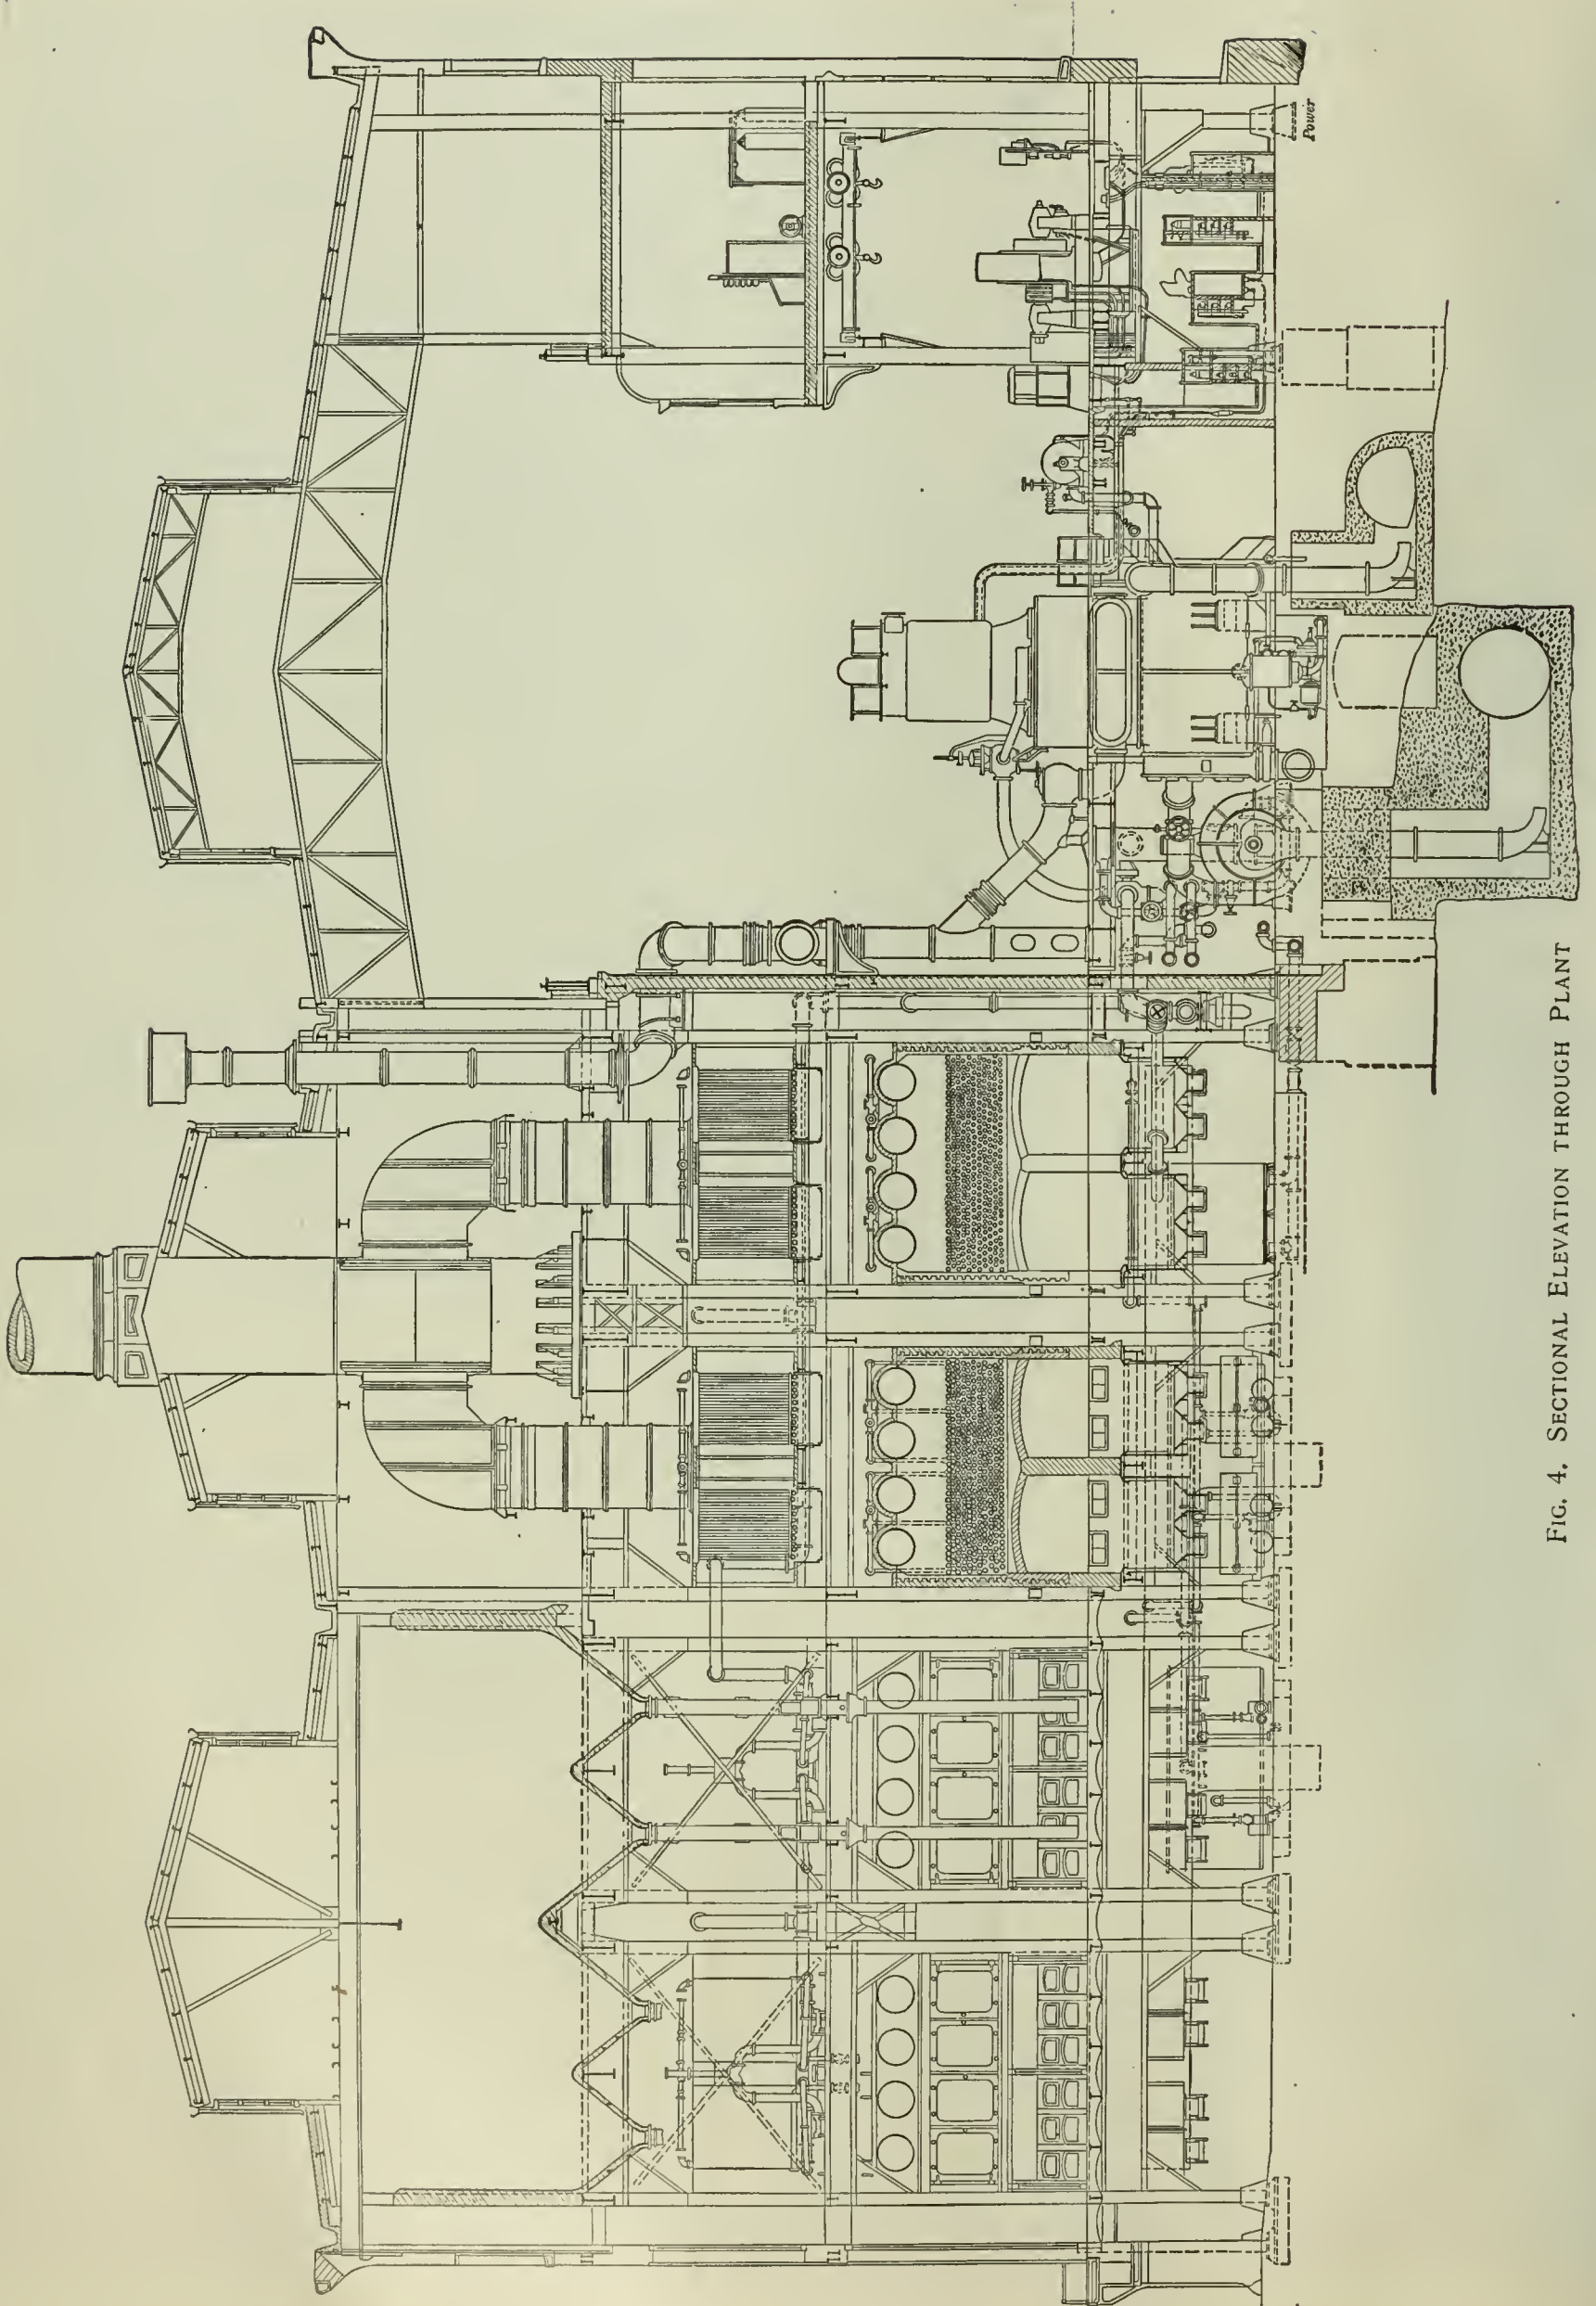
SECTIONAL ELEVATION THROUGH PLANT
